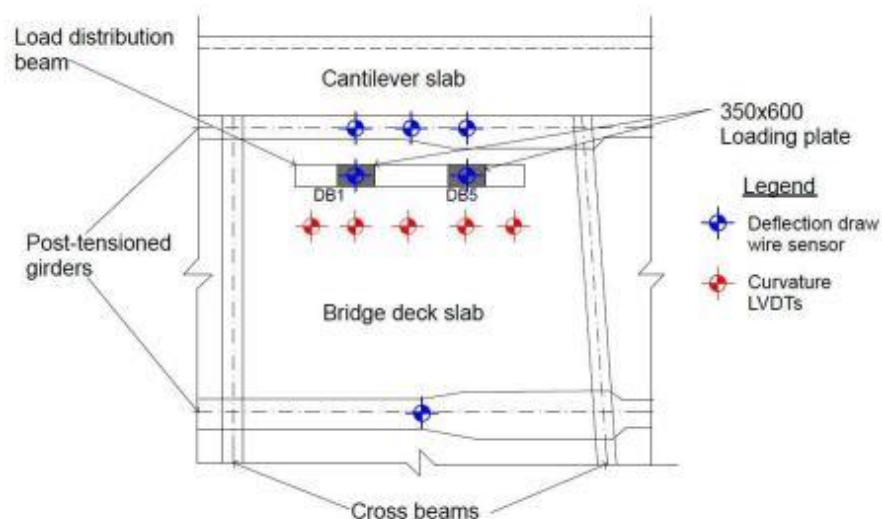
Bridge deck slab plan showing the slab full-scale test arrangement
